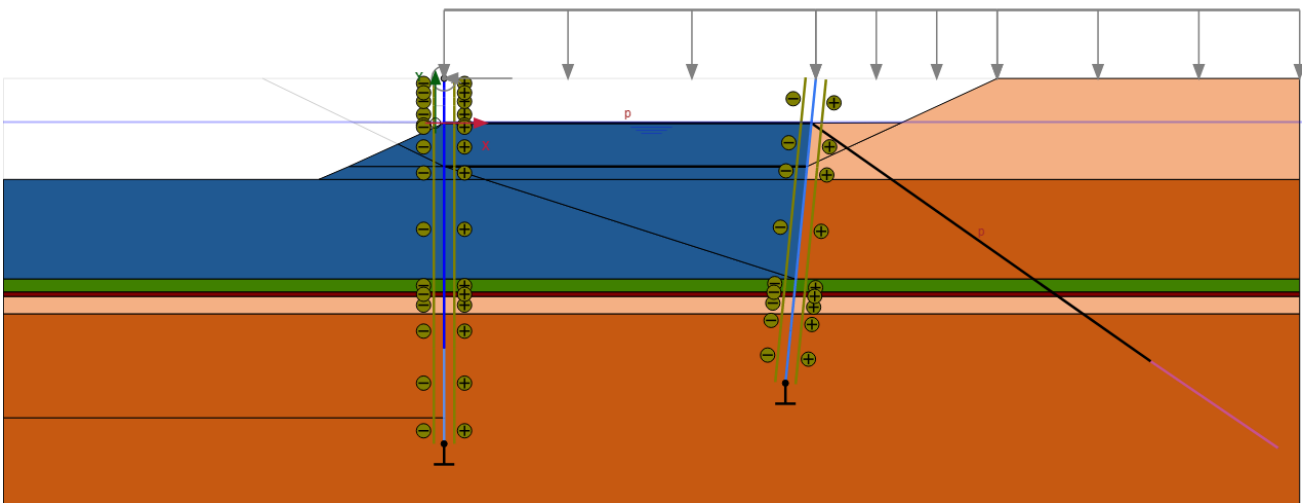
Pre-stressing of the tie rods and the grout anchors.
